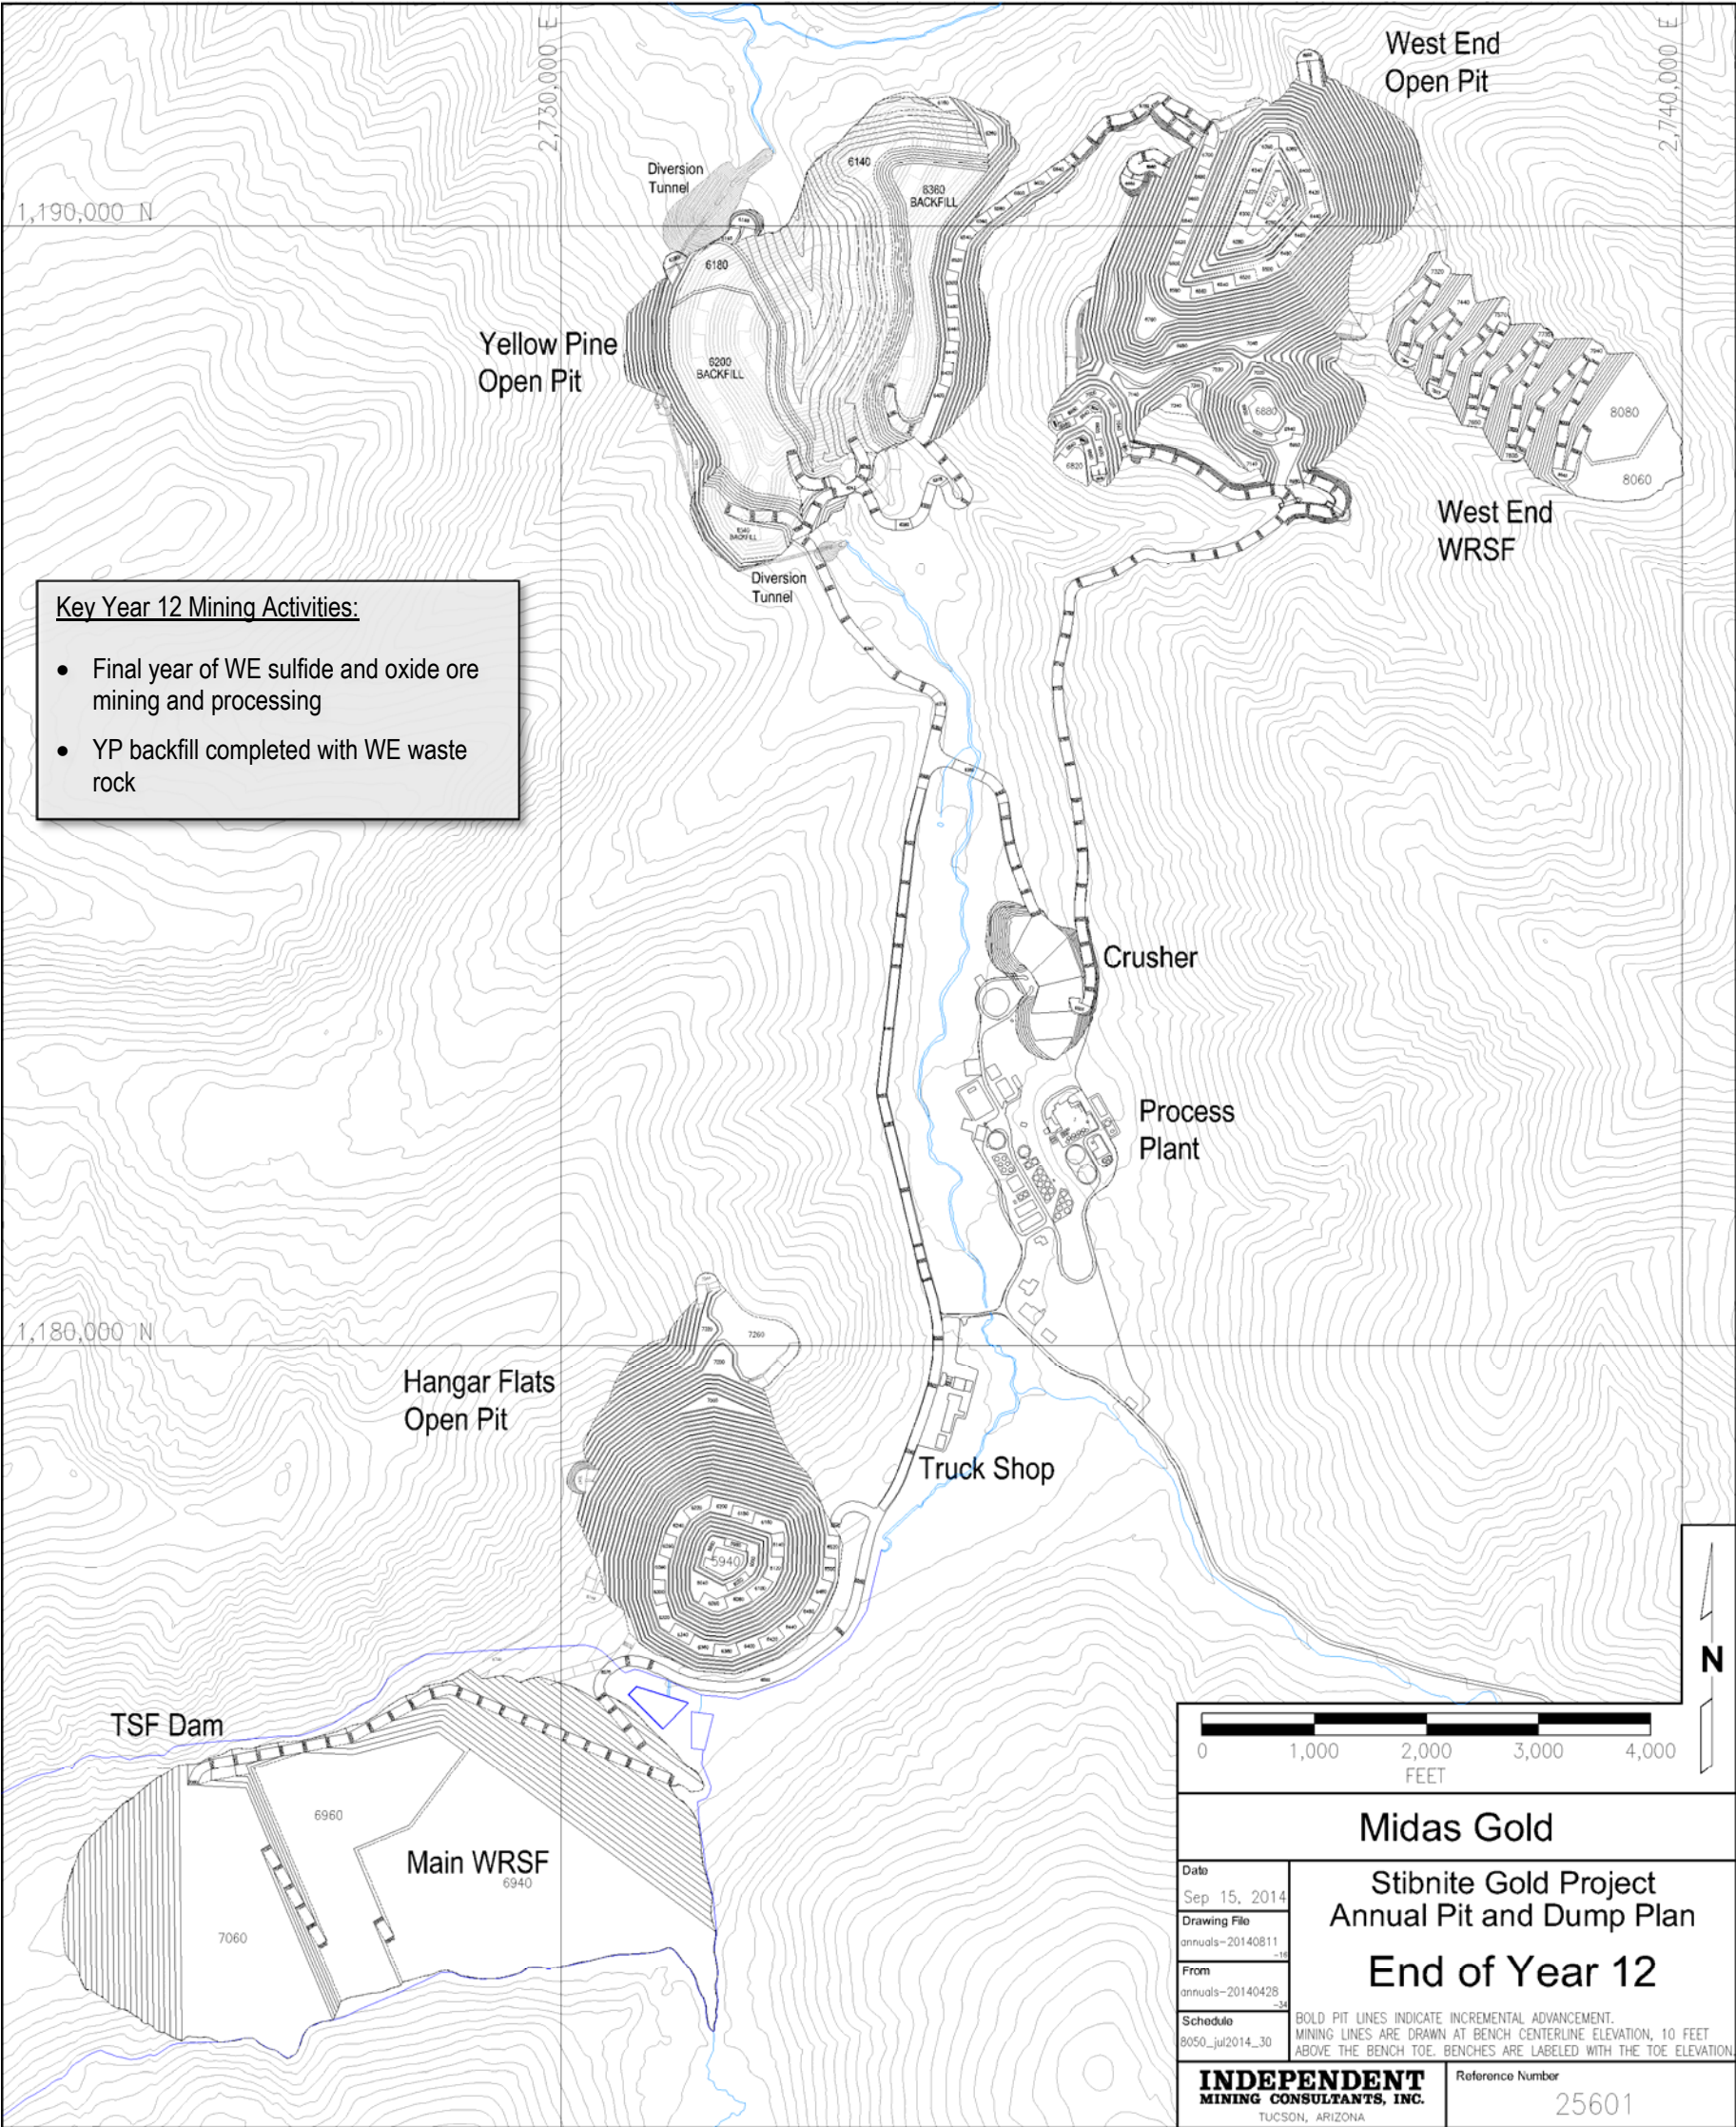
Annual Open Pit and Waste Rock Storage Facility Plan – End of Year 12
